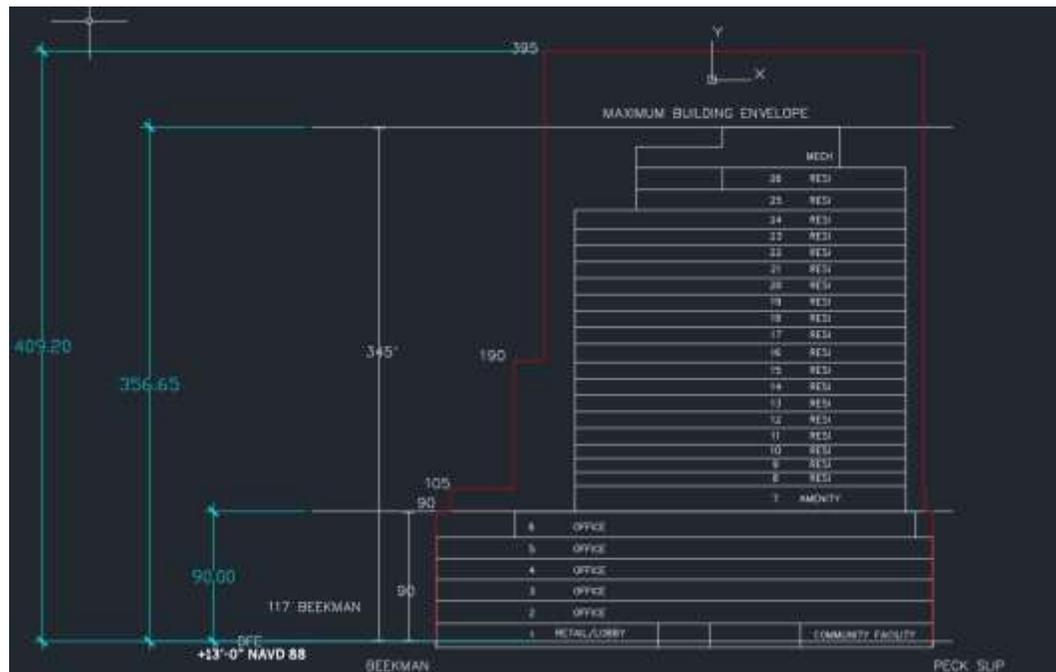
imported into CAD with CAD scaled dimensions shown in turquoise
